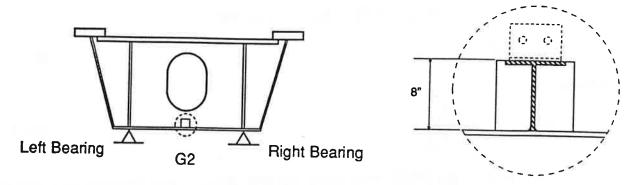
Internal Diaphragm and Bearing Stiffeners at Pier of Girder 2
